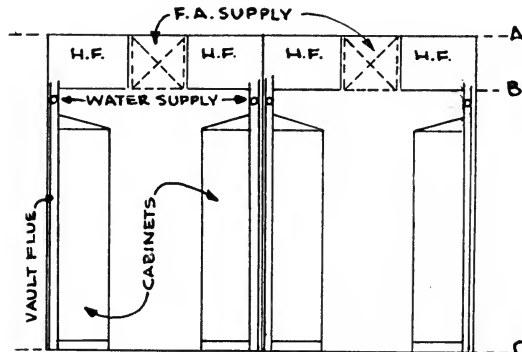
End-view elevation. A, roof line; B, conduit or hung ceiling line; C, floor; HF, horizontal flues or conduits.
